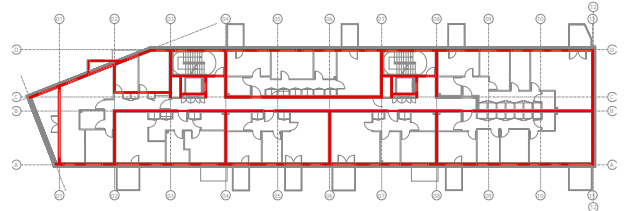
Upper Floor Layouts © EURBAN Ltd.
